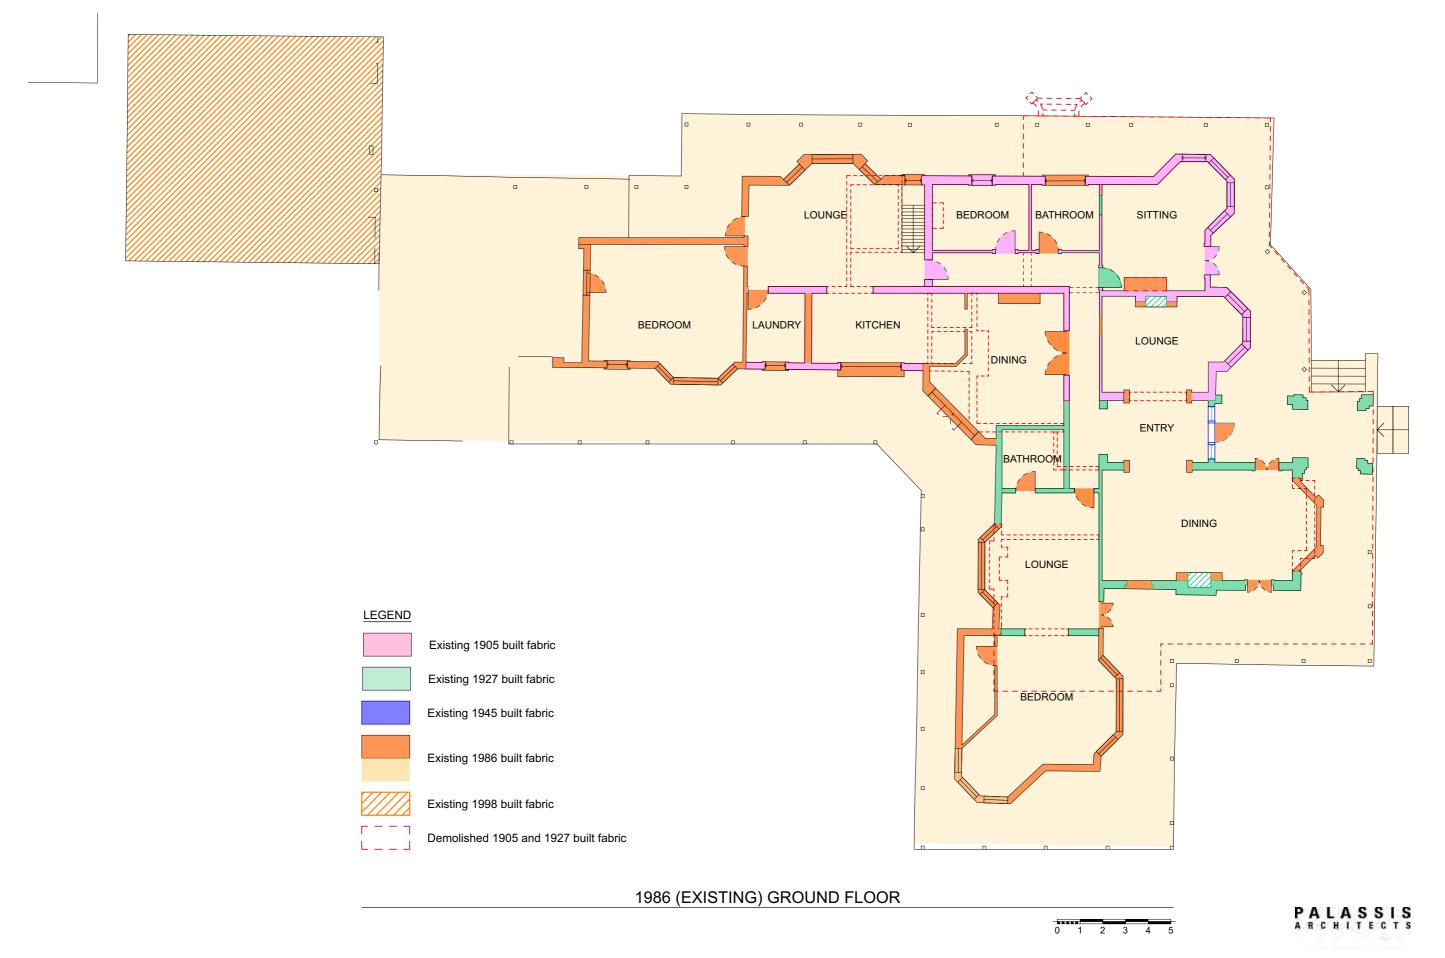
52 The Esplanade, 1986, Floor and Roof Plans. (Source: Palassis Architects 2023)
